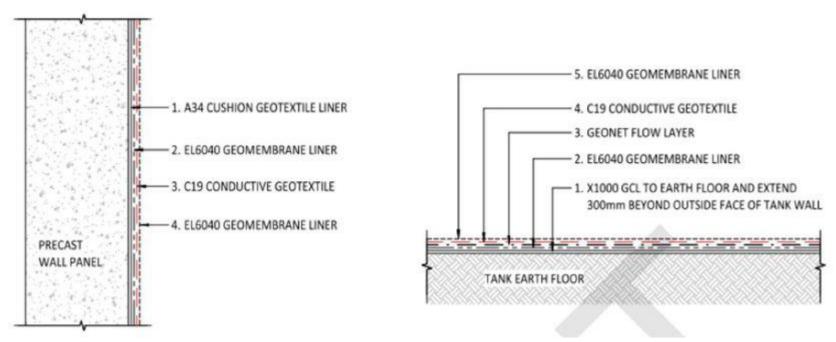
Indicative section of Chloride brine storage tank liner arrangement
